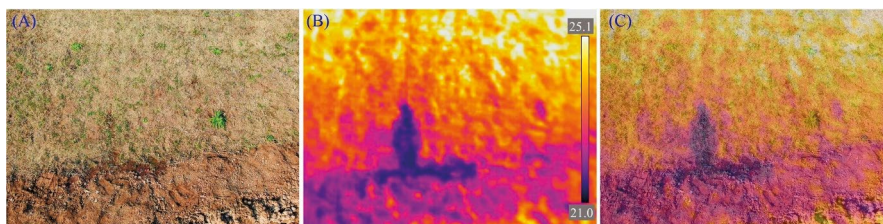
Actual view of the seepage: A – RGB camera view; B – thermal imaging camera view; C – combined view
